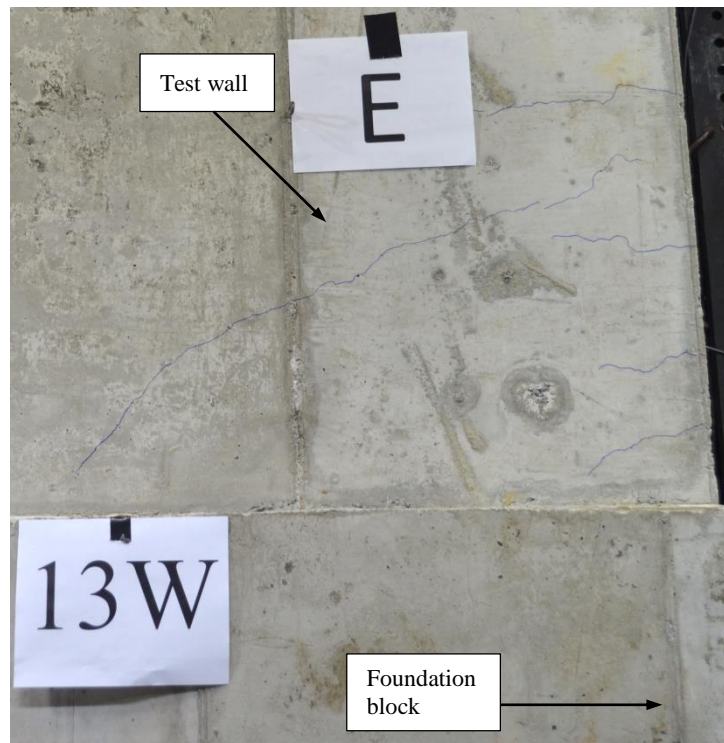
Photograph of observed initiation of concrete cracking on the East side Wall 1
